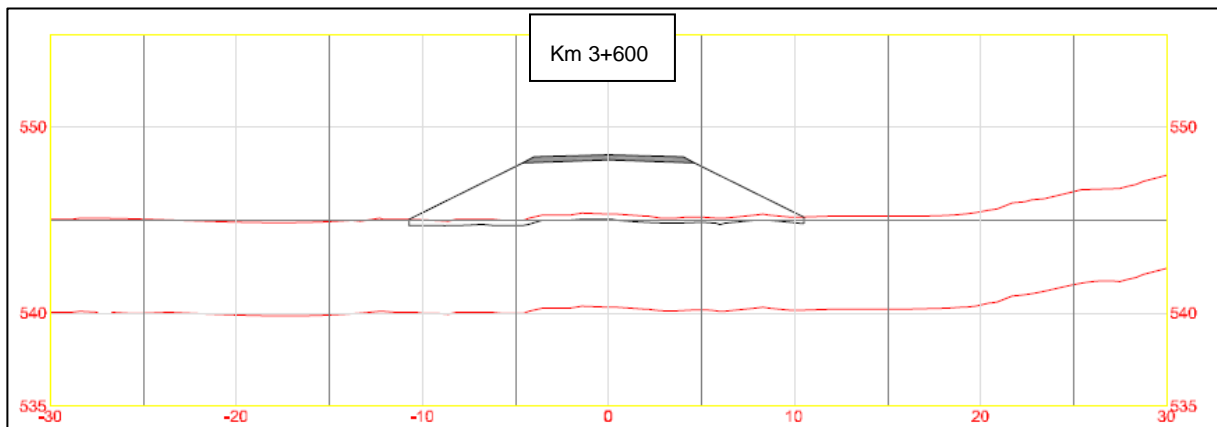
Example of Proposed Road Section that was not Flagged for Field Review
